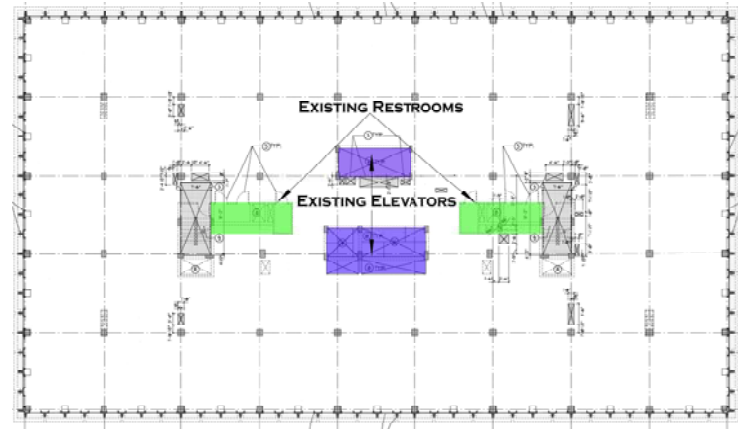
Existing floor layout with elevators in blue and restrooms in green
